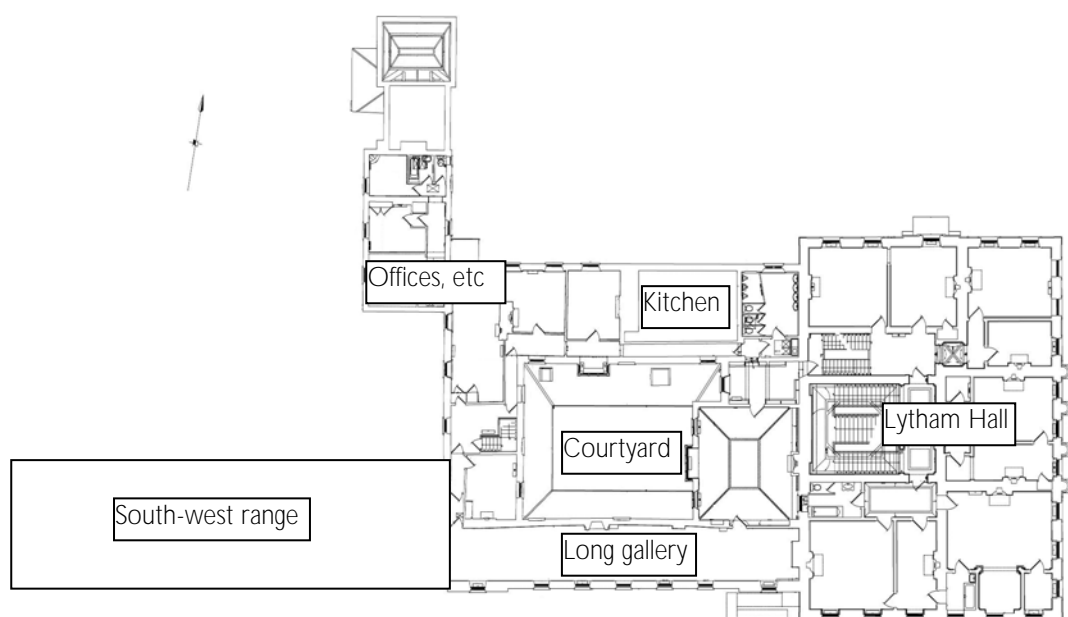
First Floor plan, showing areas mentioned in the text, based on Foster Survey 2007 drawing, with permission Lytham Hall Heritage Trust. NB the South-west range not to scale
